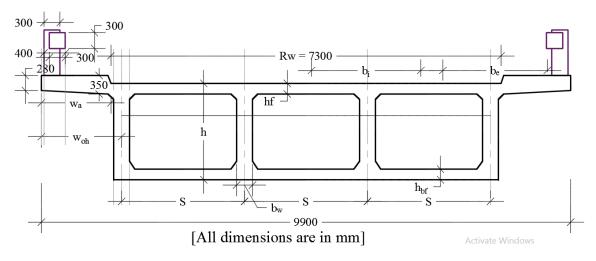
Cross Sectional Model of Box Girder Bridge
